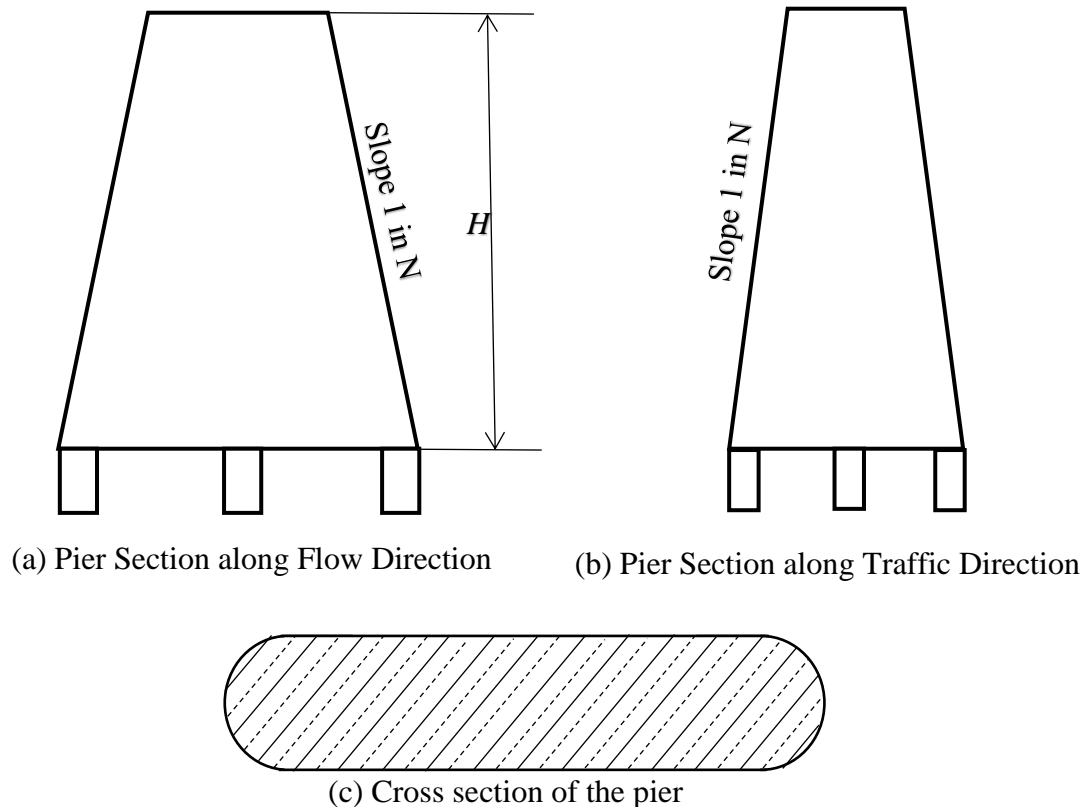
Plan and Elevations of typical Solid Gravity Pier used in this study
